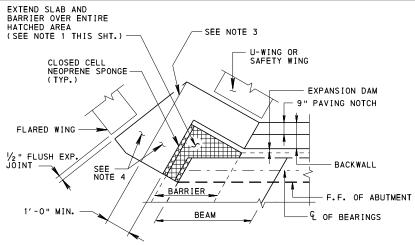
° ABUTMENT WITHOUT BACKWALL FLARED WING
